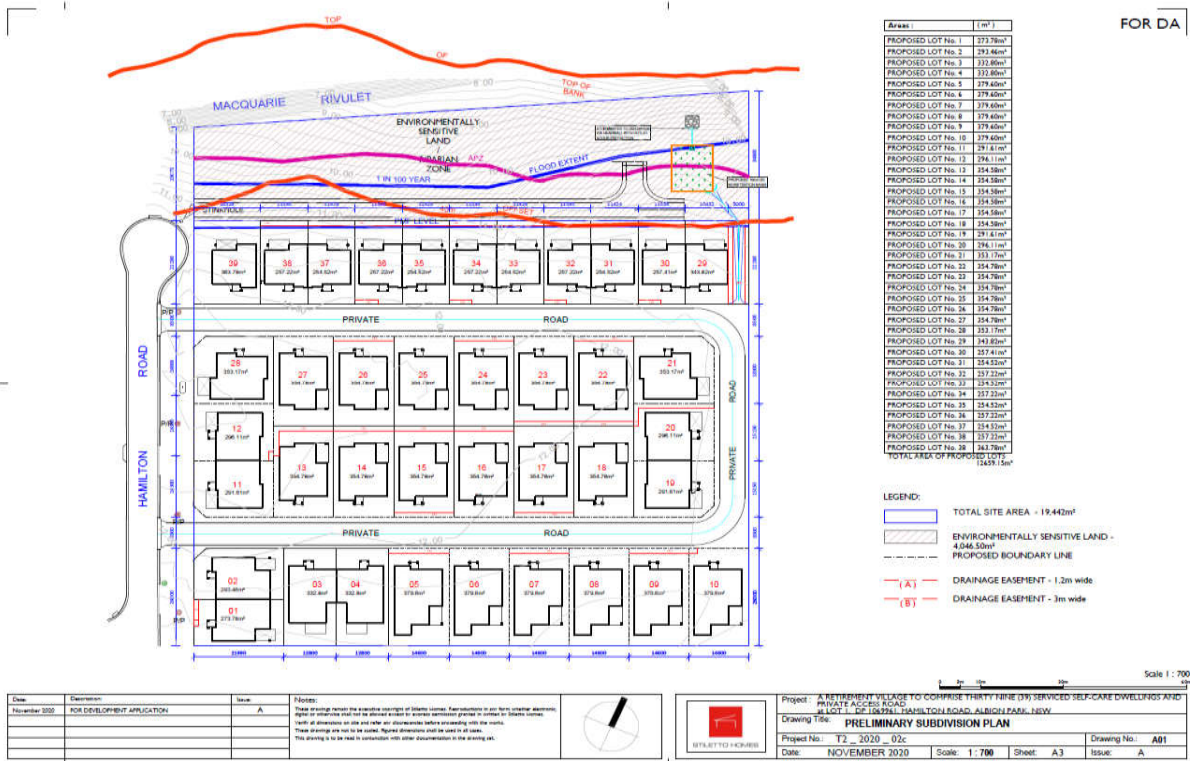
Extract of Preliminary Subdivision Plan Dwg. No. A01 Issue A dated November 2020 as prepared by Stiletto Homes.
